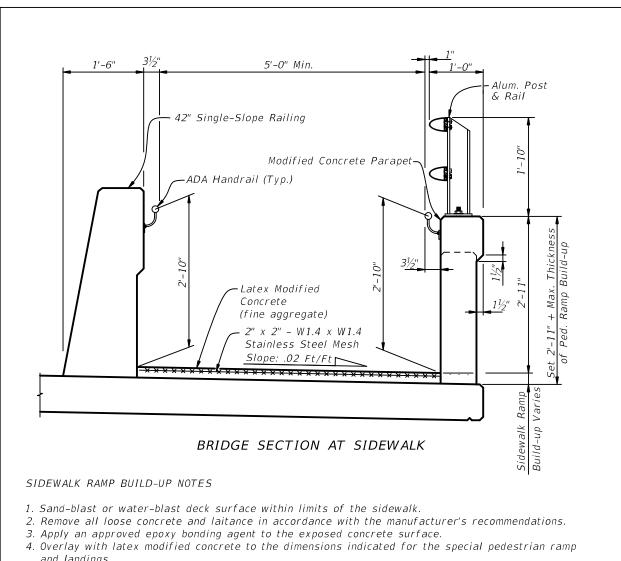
Bridge Section At Sidewalk With 42" Single-Slope Traffic Railing
